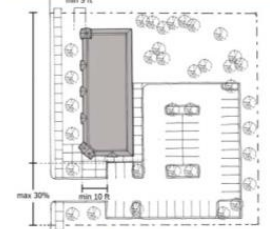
(Parking Lot Location): Side and rear yard parking provided in accordance with maximum 30% of frontage and minimum 10-foot front facade setback including landscaping requirements as required in Section 120-68.6.
